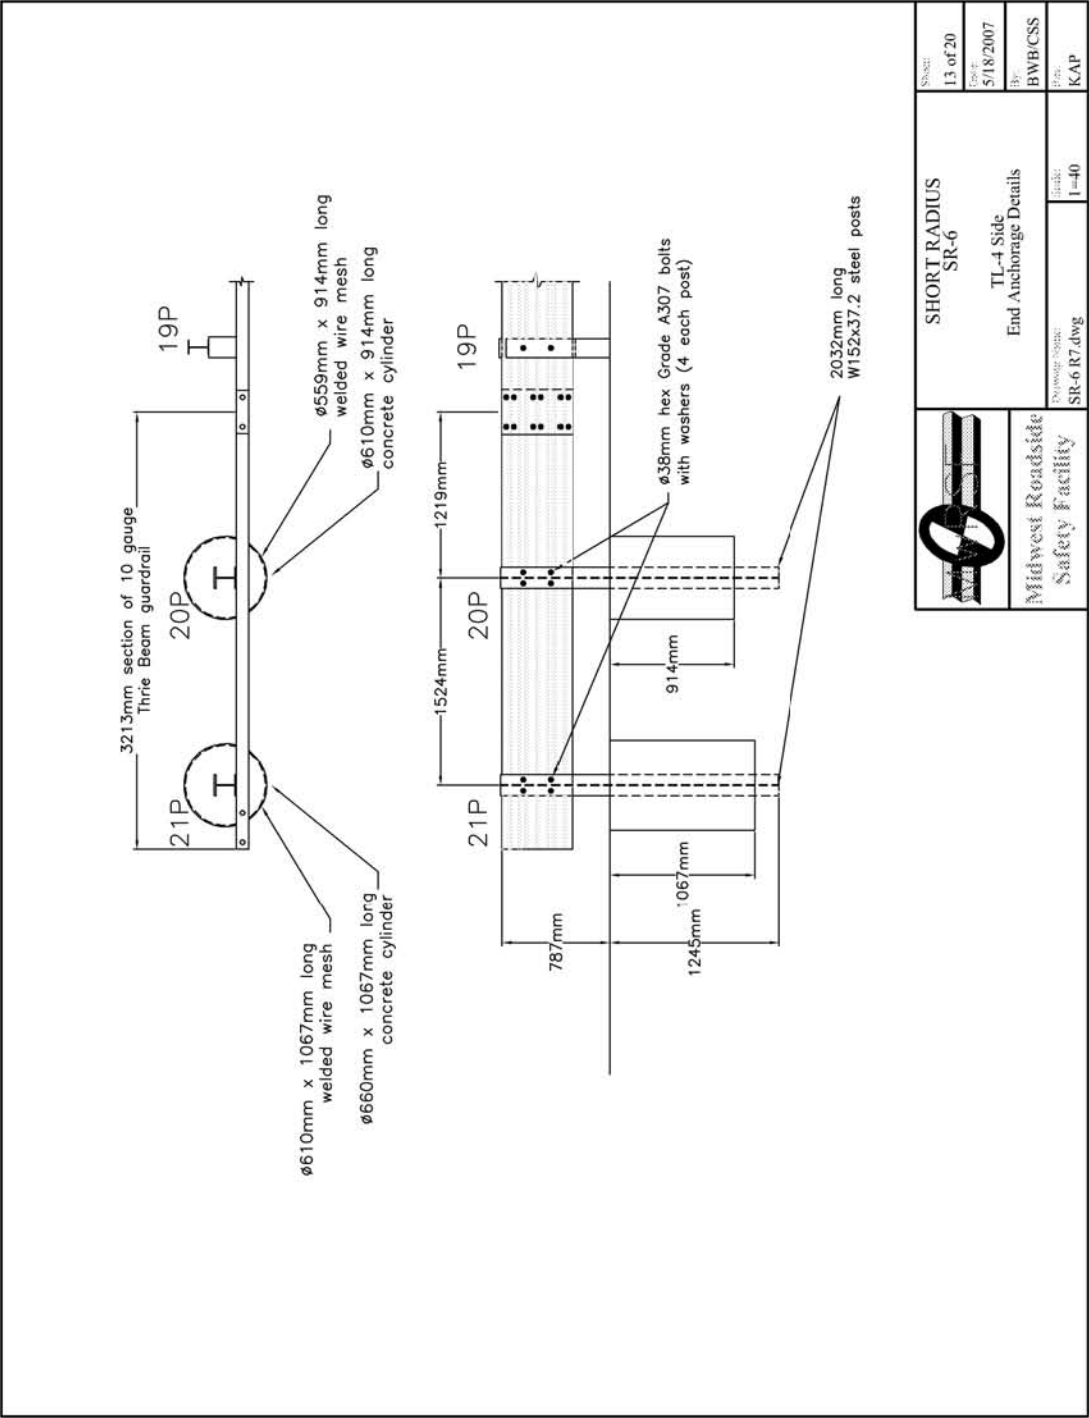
Primary Side End Anchorage Details, Test SR-6
